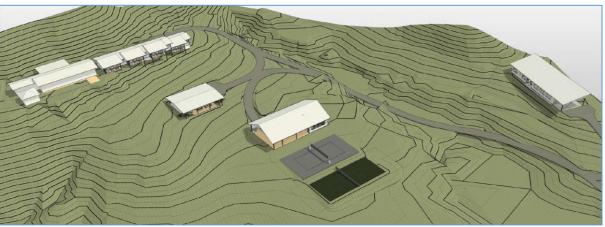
PROPOSAL PLAN EXTRACT: ISOMETRIC CONCEPT
